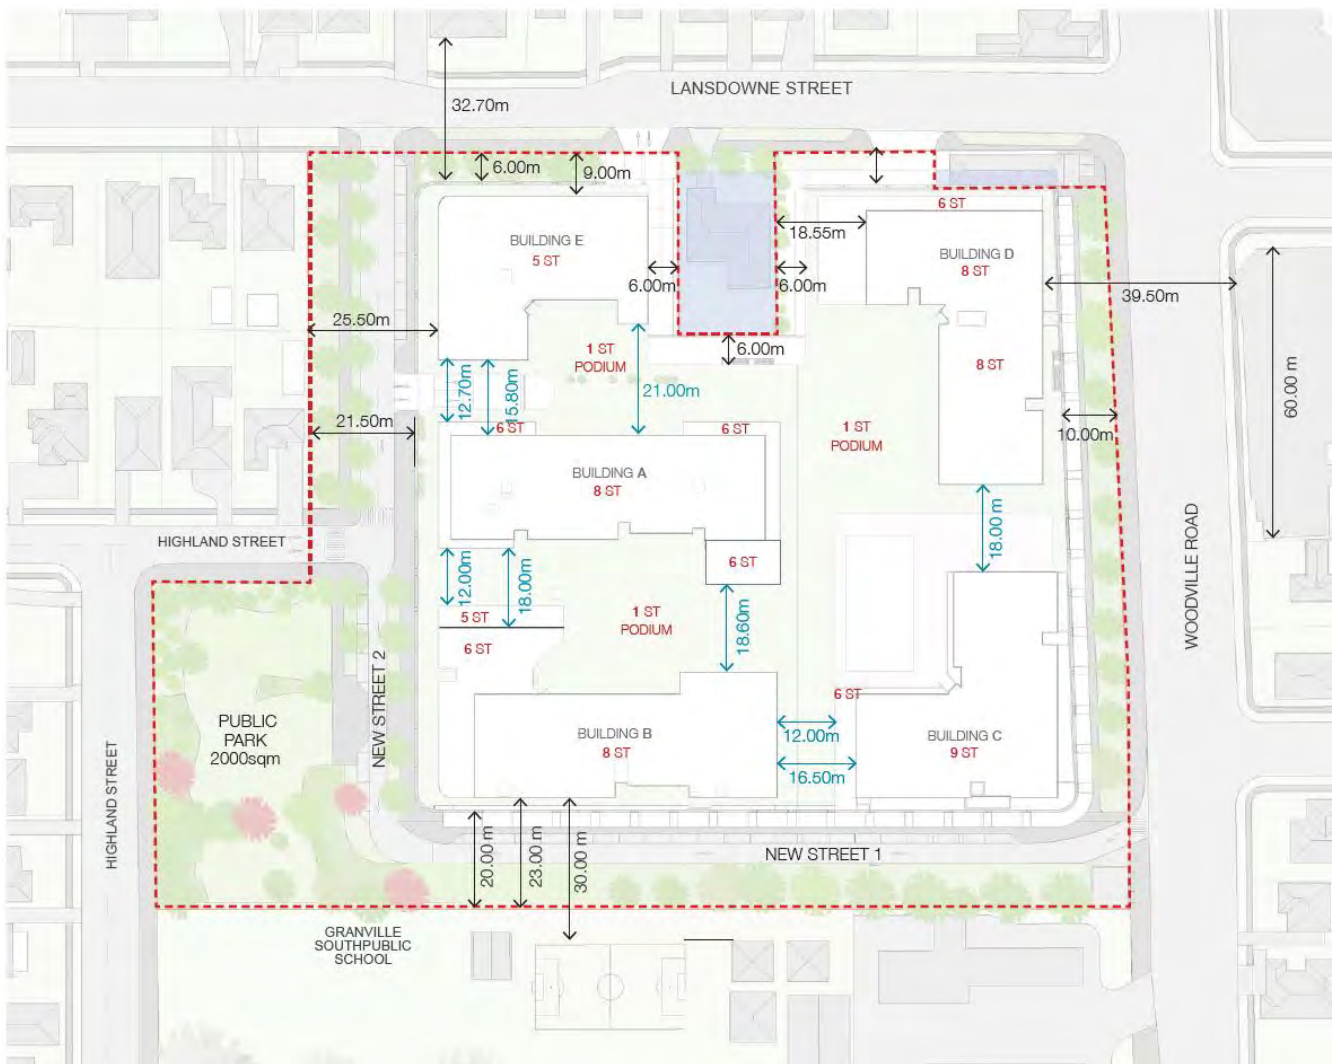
Site plan of approved mixed use development on the subject land in DA No.2020/0493
